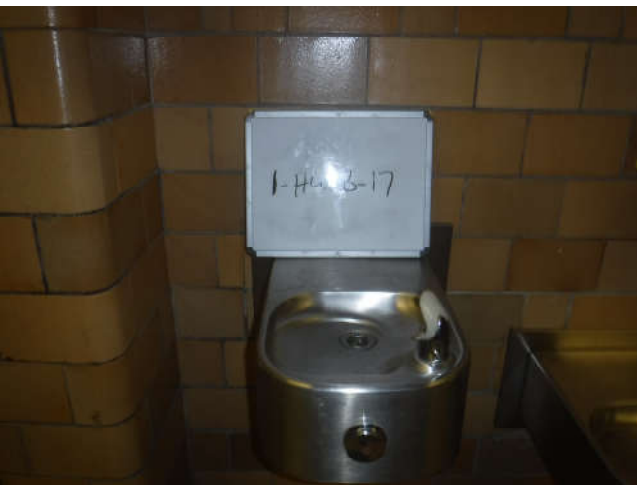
Bubbler, located on the 1st floor between boys & Rm 130A (left)
